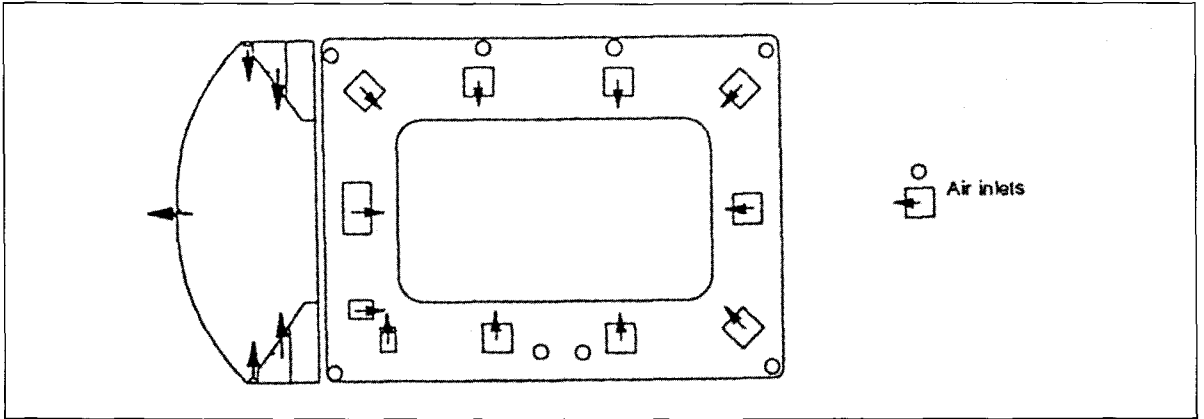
Gjevik Olympic mountain hall, air inlet and outlet in principle. Section and plan view
